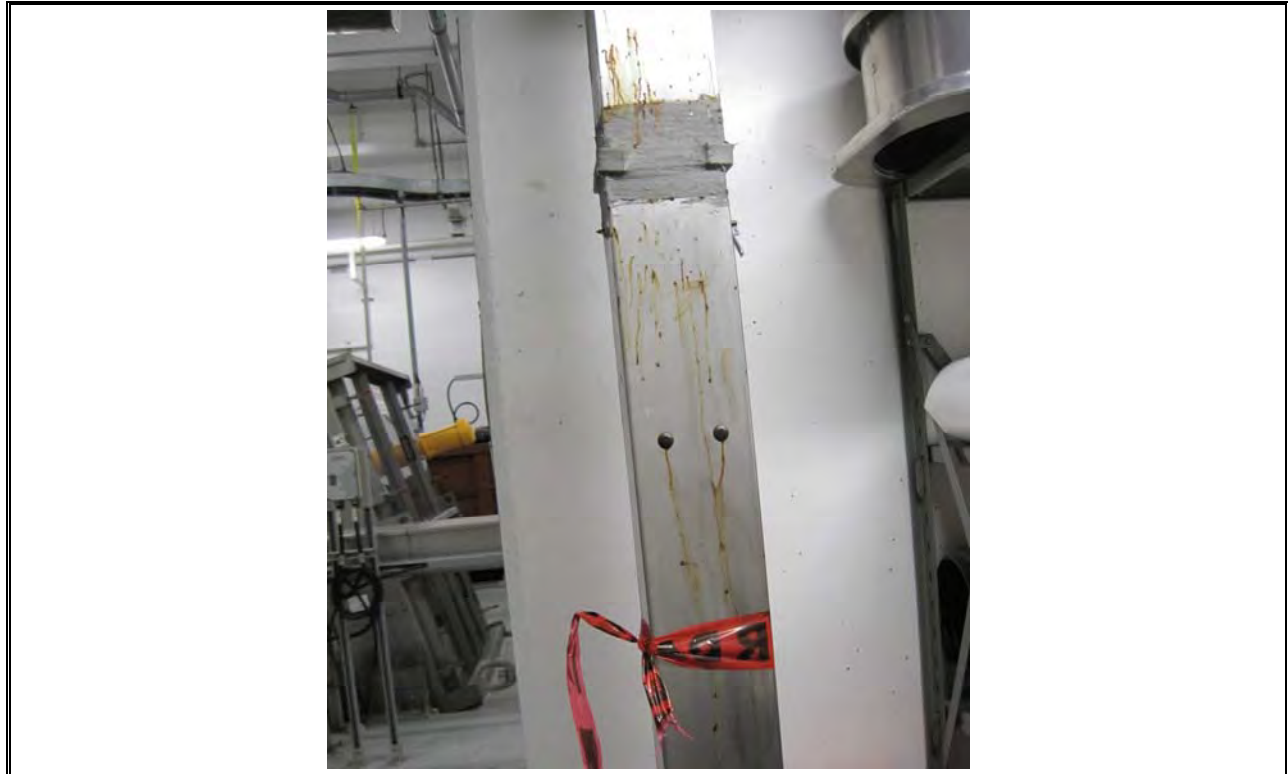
Dartmouth Ductwork Issues throughout the Plant
